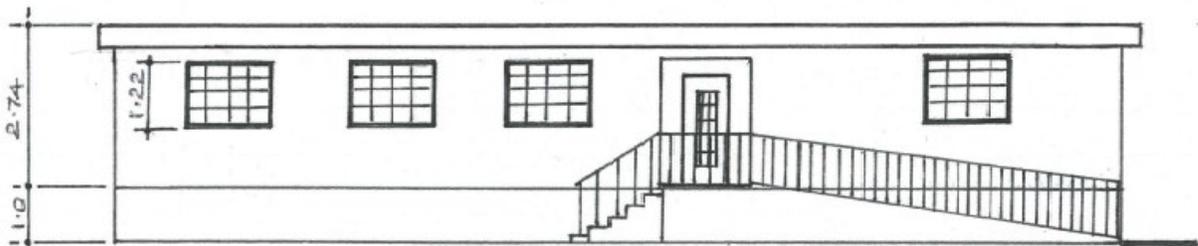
Front elevation of the existing trailer, proposed to be used for an office
